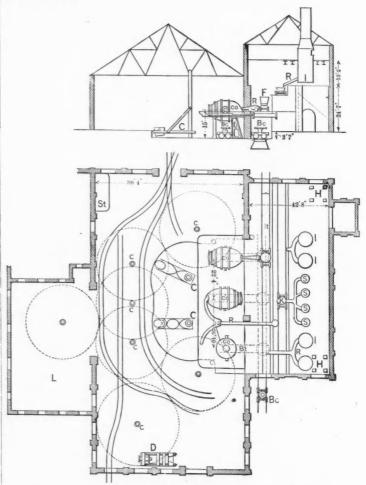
CROSS SECTION AND PLAN OF NEW EDGAR THOMSON CONVERTING MILL.
